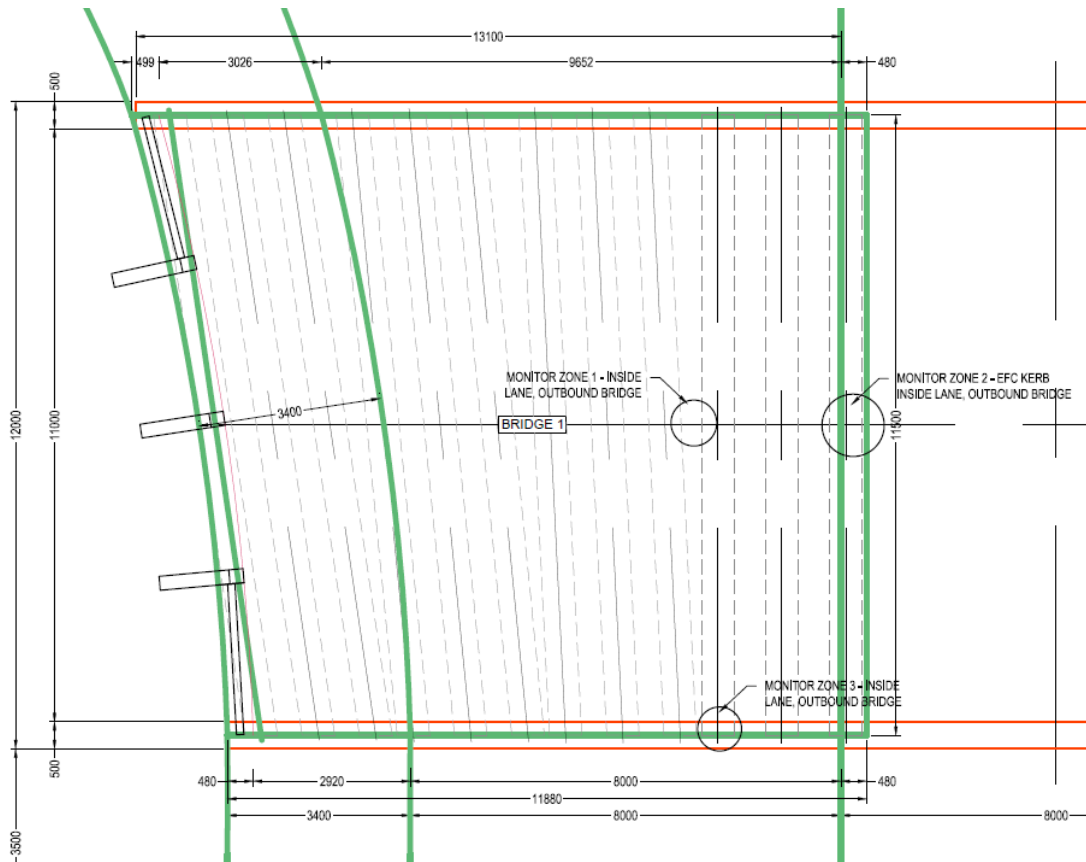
Monitoring Zones at Toowoomba Bridge Site, QLD (i3 Consulting Pty Ltd).
